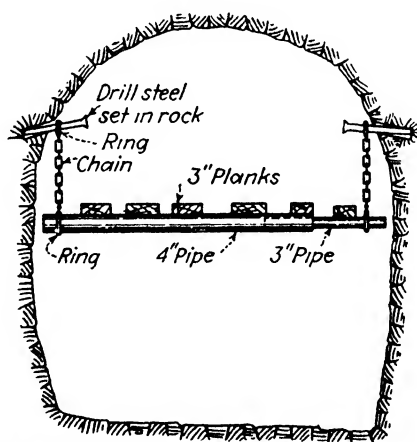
Drillers' scaffold utilizing telescoping pipes hung from pins in the walls as deck support.
